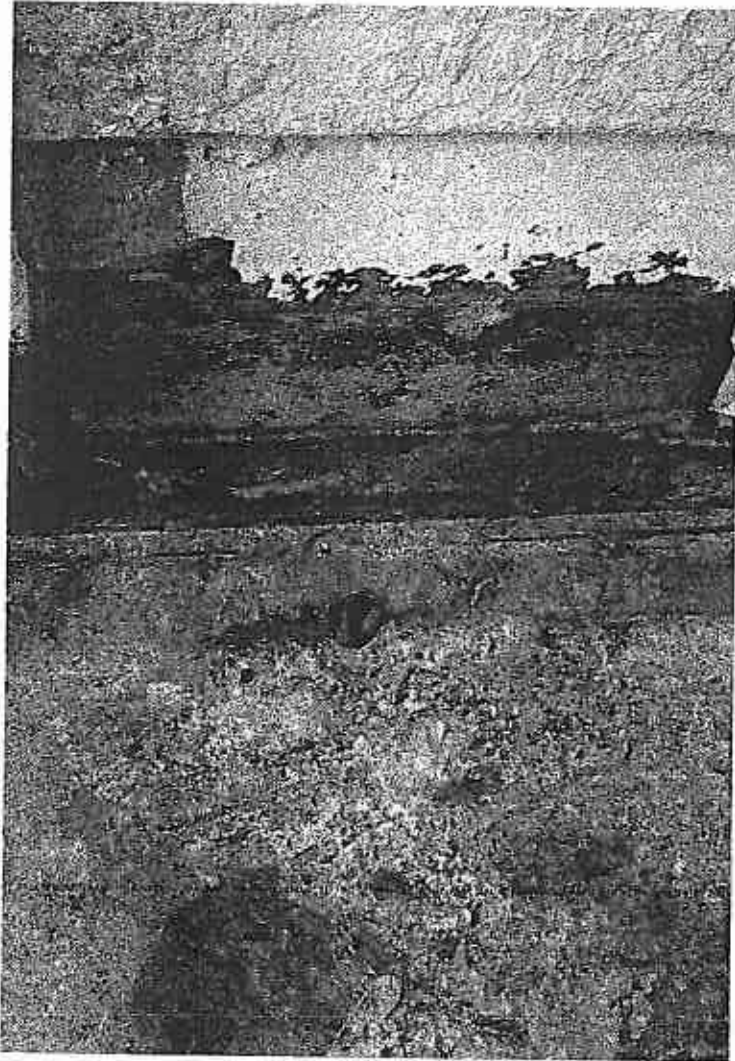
and 3 - Show areas of delaminated concrete on the west side of the main entrance suspended slab where the Emaco T-430 structural repair mortar will be utilized for the infill.
